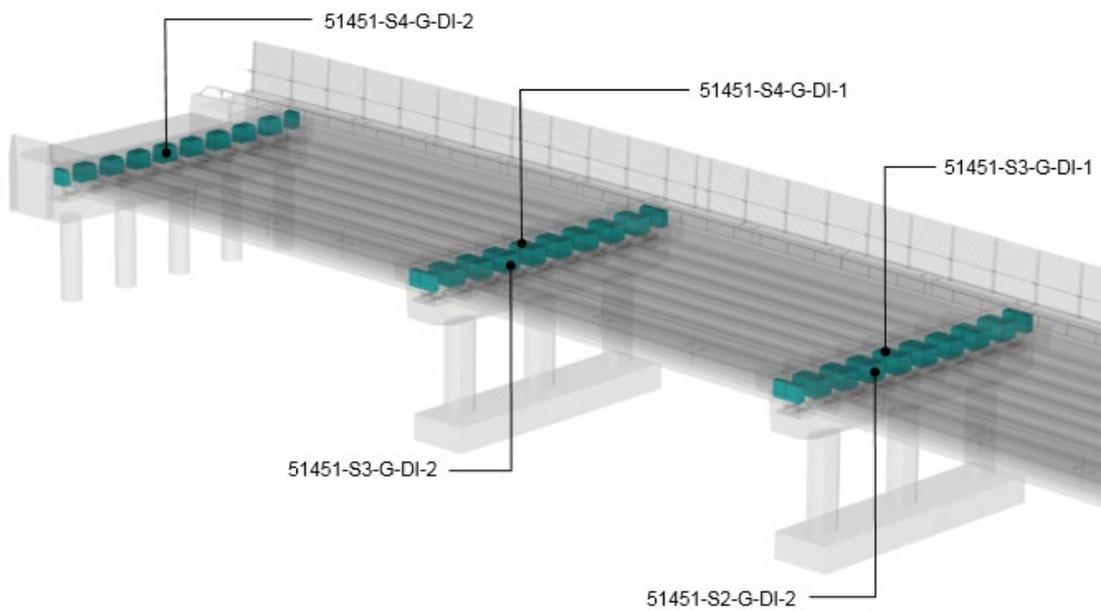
(c) – Naming convention for concrete diaphragm objects
